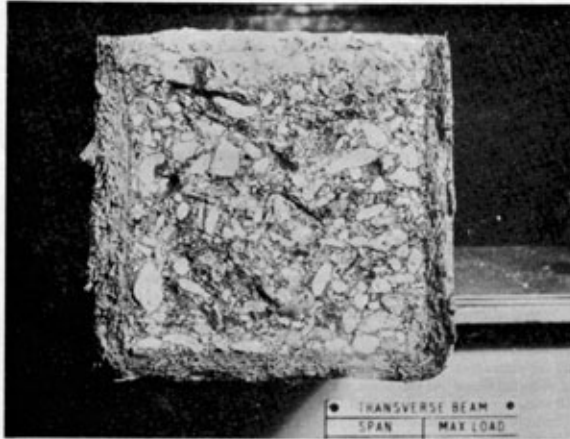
Fracture plane of channel section GRC and plain concrete composite beam.
